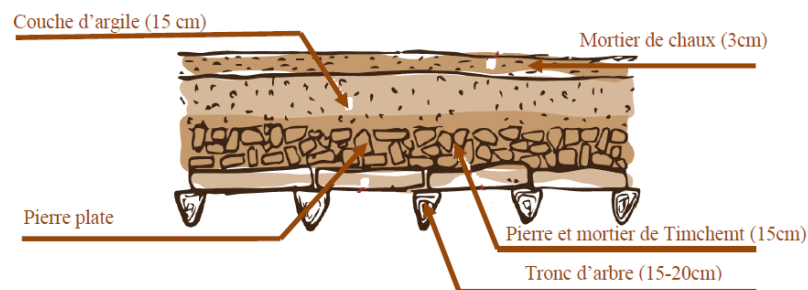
Cross-section of a tree trunk and flat stone roof [70].
